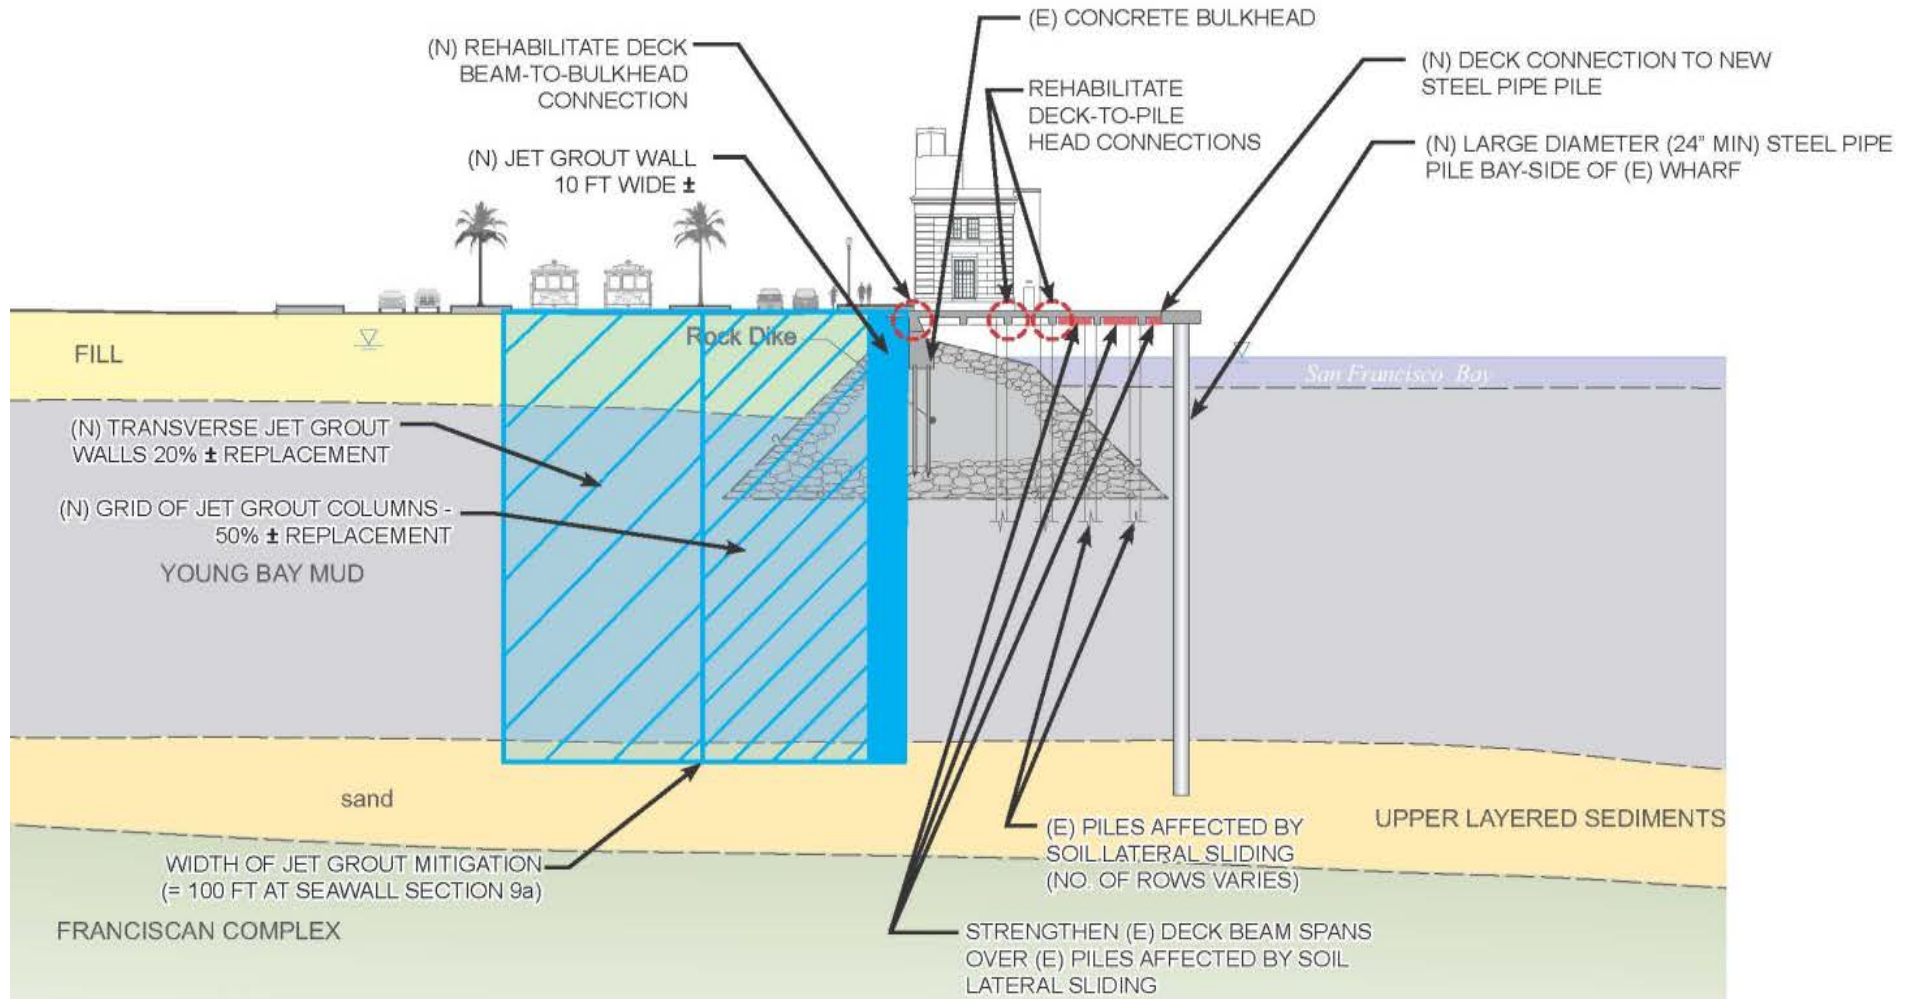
Combined Mitigation Alternative - Jet Grouting & Deep Soil Mixing and Bulkhead Wall & Wharf
